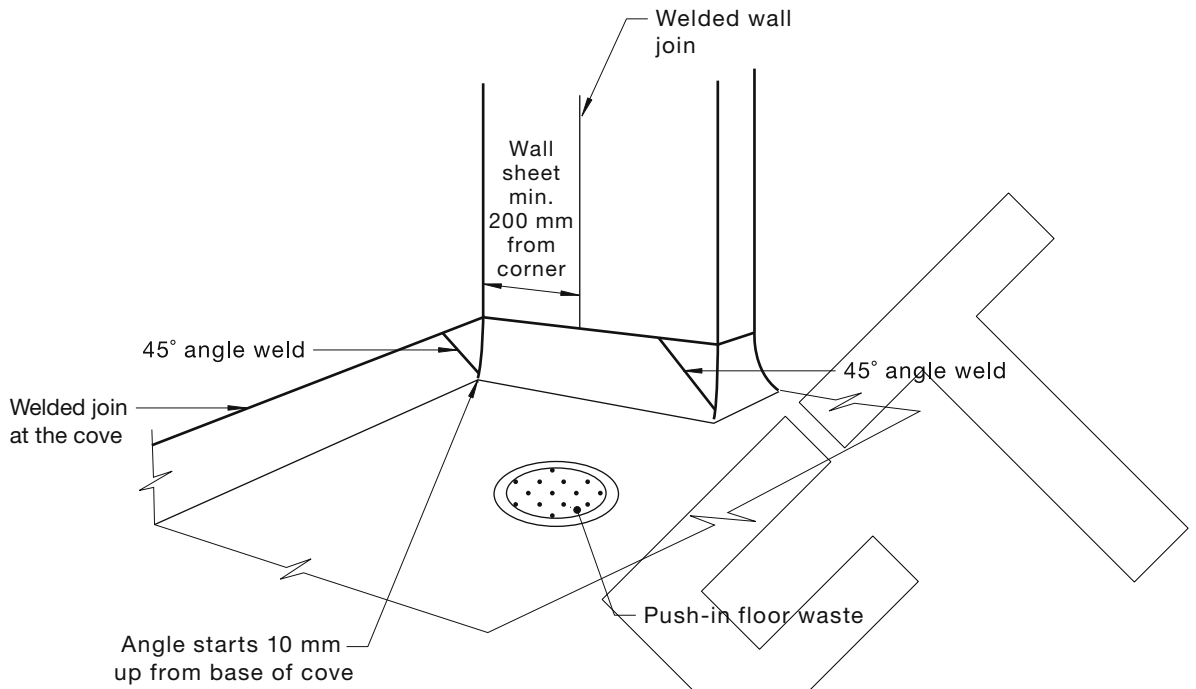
HEAT WELDED METHOD (INTERNAL AND EXTERNAL CORNERS)
